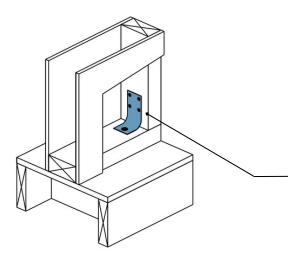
TIMBER FLOORS • EXTERNAL WALLS • GIB HANDIBRAC®
